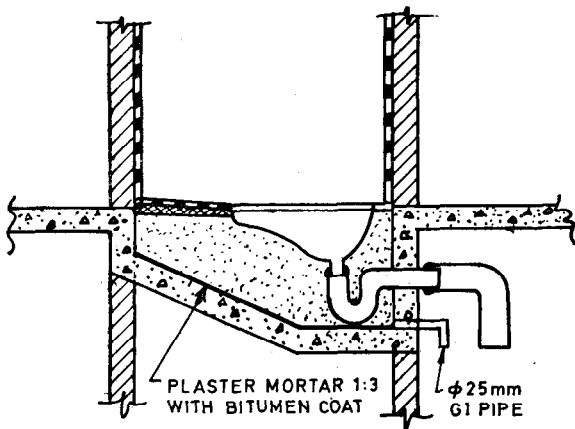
TYPICAL SKETCH OF DEPRESSED SLAB AND ARRANGEMENT OF JOINTS IN WC
